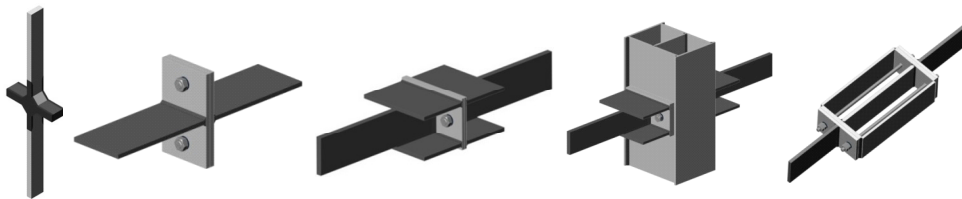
Weld details and T-stub typologies (Univ. Stuttgart) [2]
